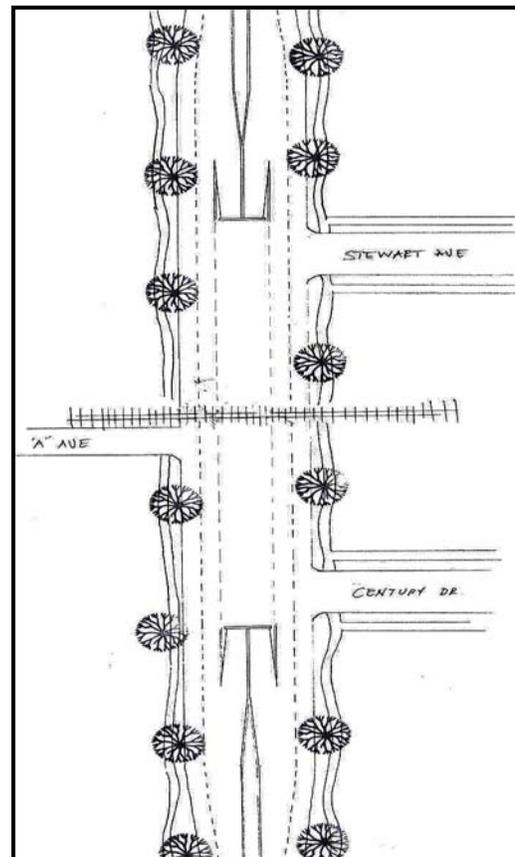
Sketch of an underground tunnel with surface crossings.
